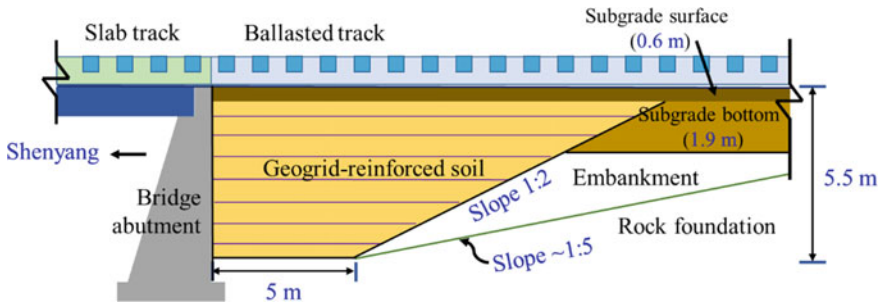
Schematic of the studied railway earthworks at bridge approach of Shahe Grand Bridge
